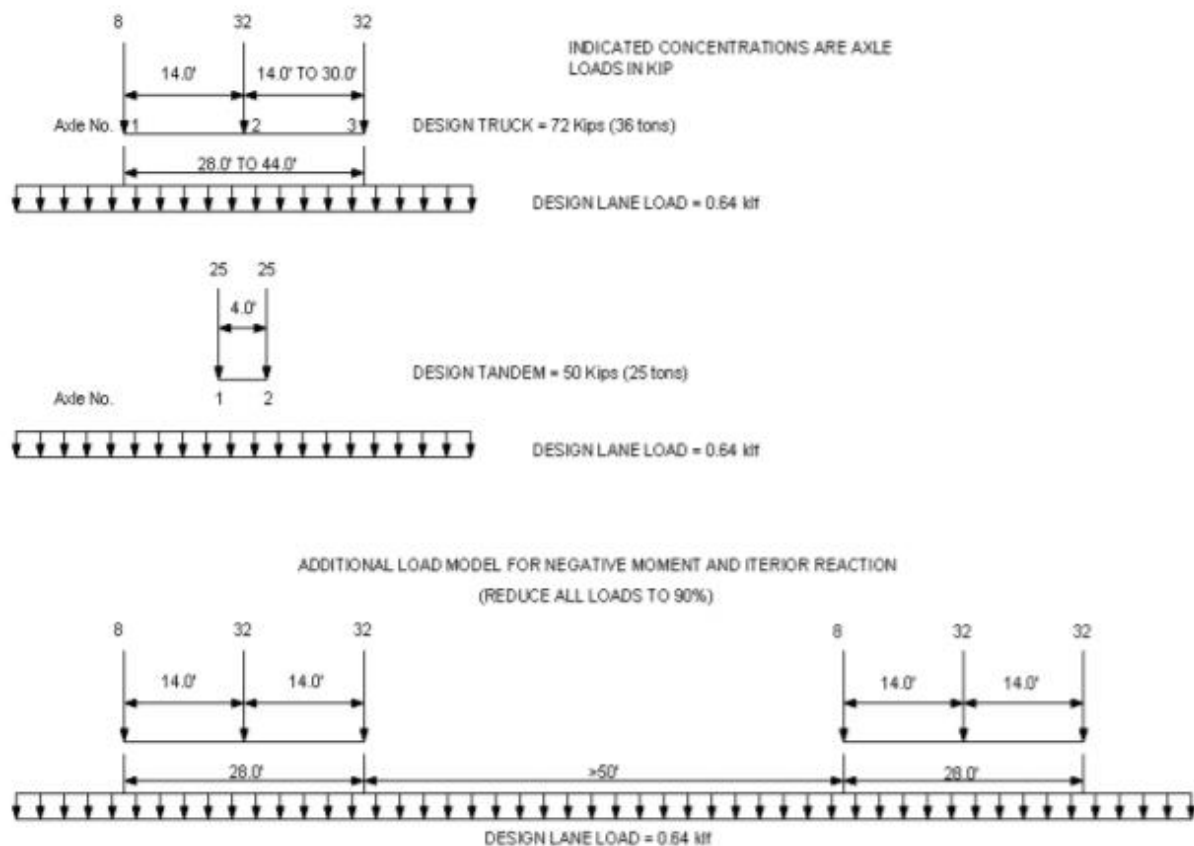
HL-93 Design Load (Ellingwood, 2009).
